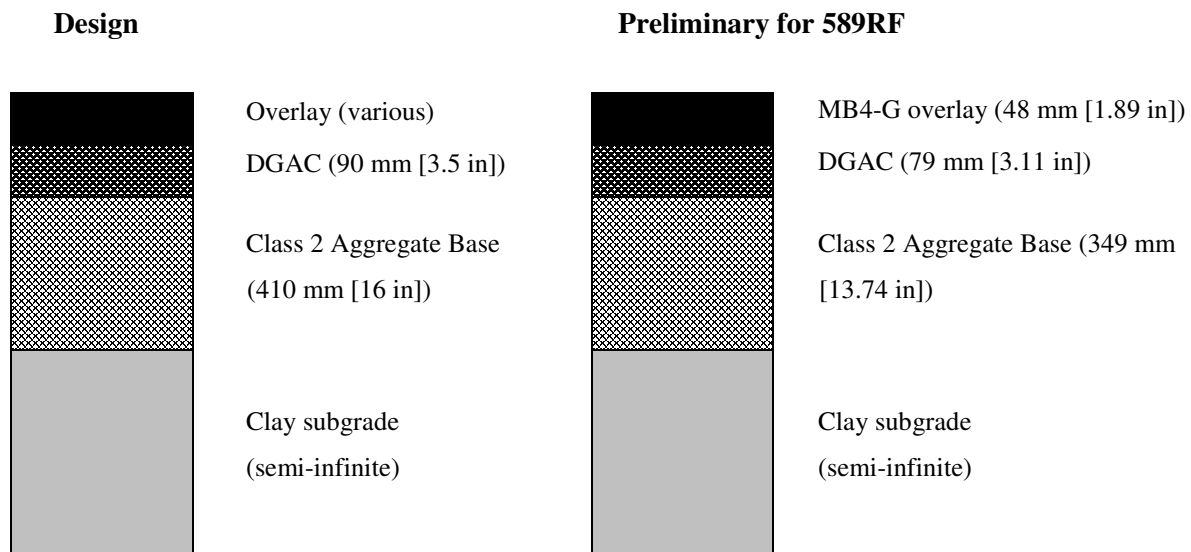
Pavement design for the Reflective Cracking Study test track
